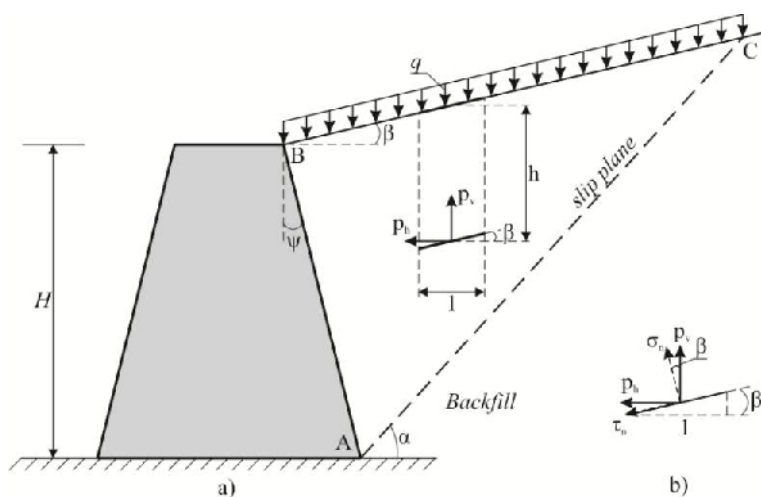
The assemble retaining wall – backfill: a) general characteristics b) pressures on the inclined element – decompositions details
